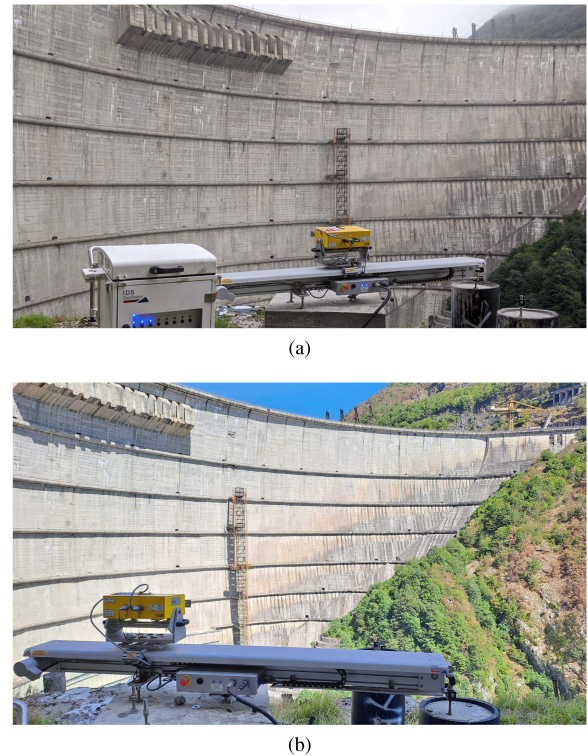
Case study at Enguri Dam in Georgia. (a) First point of view oriented toward the central part of the dam. (b) Second point of view oriented toward the surrounding rocks.
